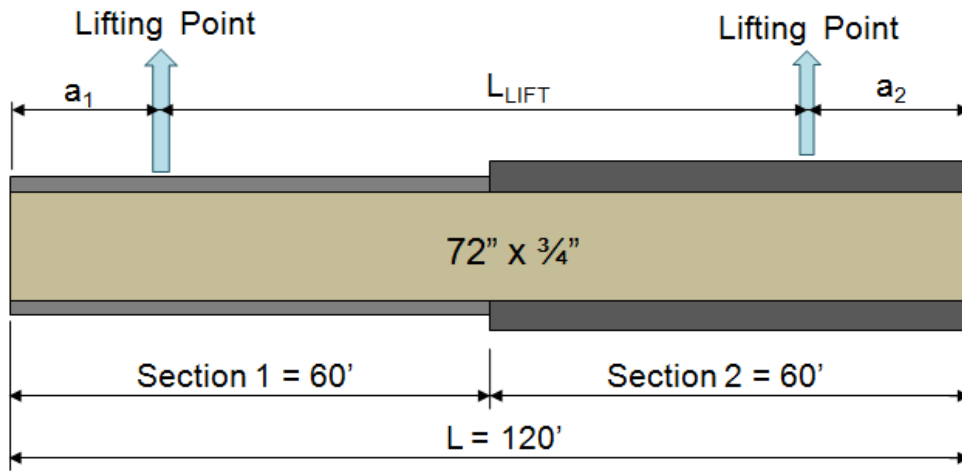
Two Cross Section Girder Schematic (60' - 60')
